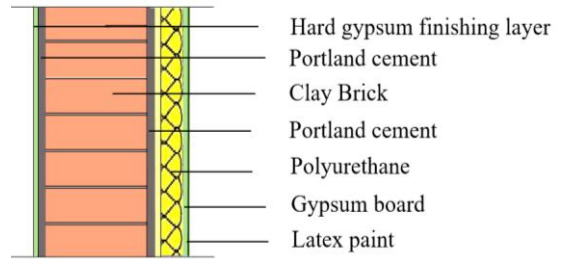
The converted wall construction cross section. By adding a thermal insulation layer (polyethylene) and a layer of gypsum board. The U-value of the wall is improved until its value reach to 0.20 W/m<sup>2</sup> C.
